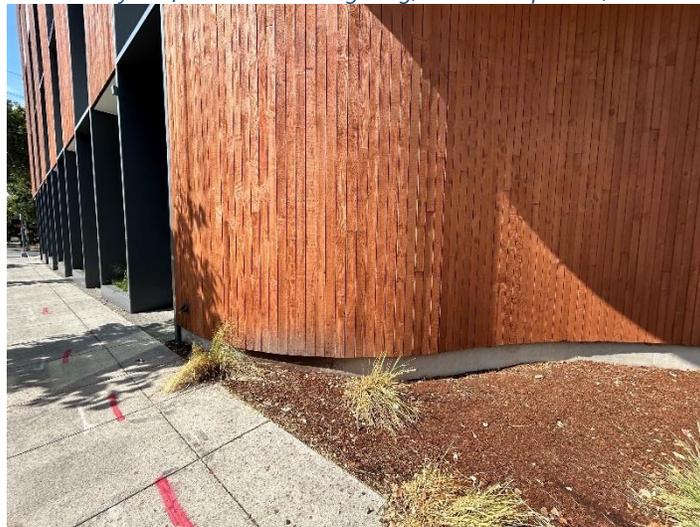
Karuna II West southeast building corner at Fremont. Base of wood siding less than 7 inches above ground level. Debris on wood veneer. Grass plantings are fair to poor condition.
